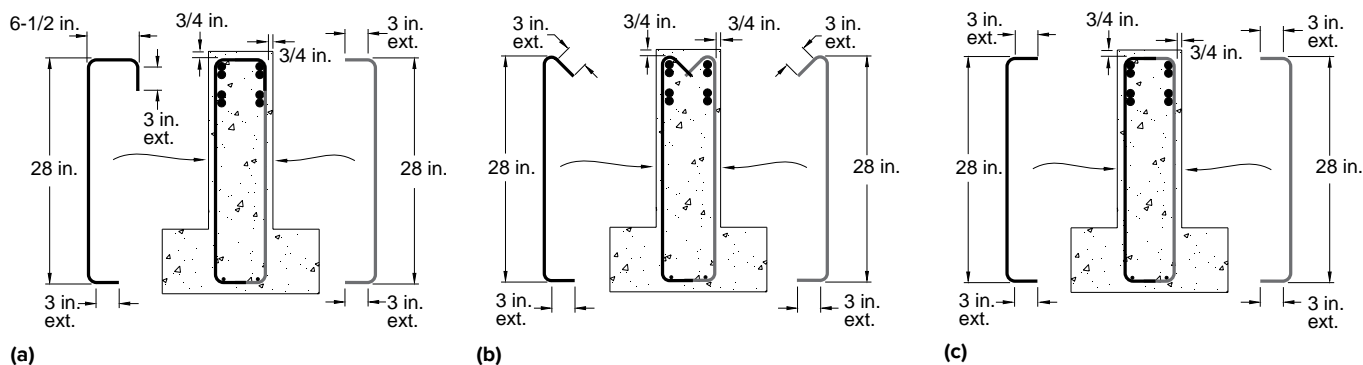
Stirrup types: (a) Type I, used in Beams T-60-8-B and E; (b) Type II, used in Beam T-60-8-A; and (c) Type III, used in Beams T-60-8-D and F (Note: 1 in. = 25.4 mm; stirrup types shown for Beams T-60-8-A and B (in Fig. 2-7 and 2-8) in Reference 8 were accidentally interchanged). All stirrups were fabricated using No. 3 bars
